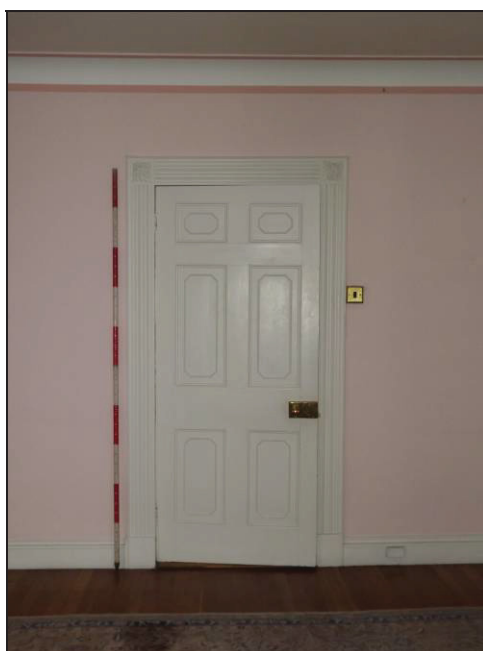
Detail of door in north wall of Room 2 (Scale = 2m)
